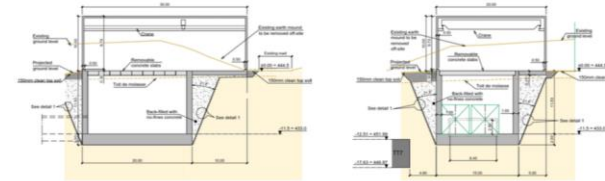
Typical Sections through the experimental hall parallel to the beam-line (left) and transverse to the beam-line (right)
